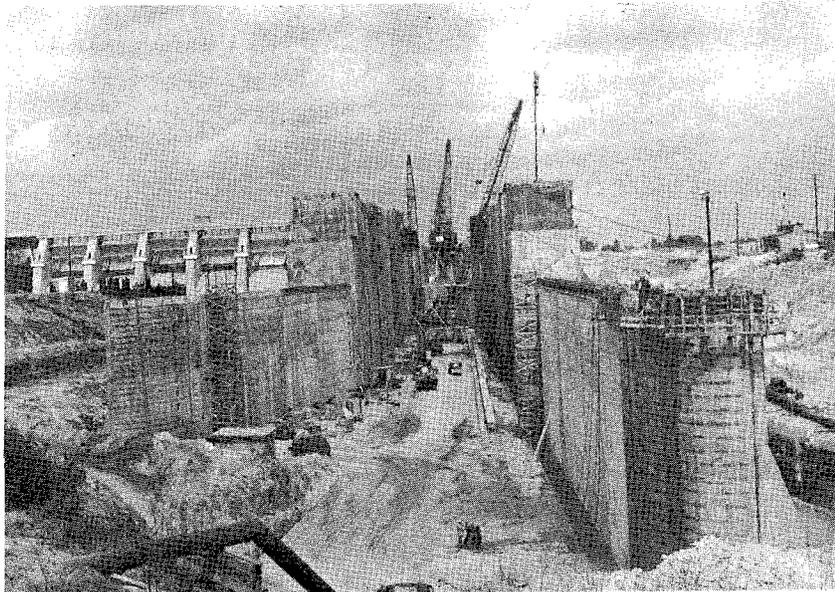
Construction of Walter F. George Lock, April 5, 1962
